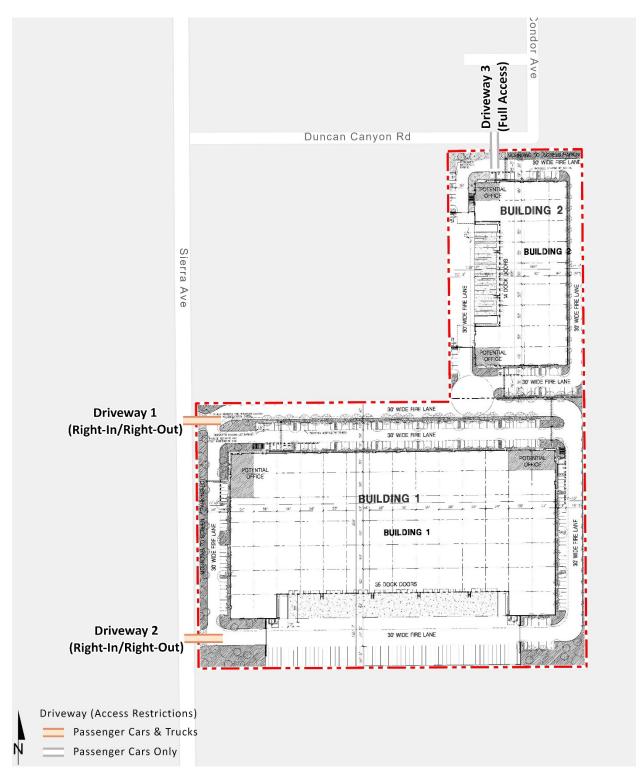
PRELIMINARY SITE PLAN
